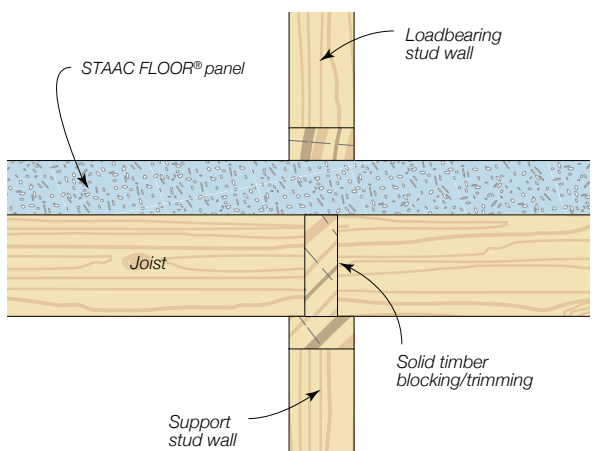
Platform Flooring with Internal Loadbearing Wall
